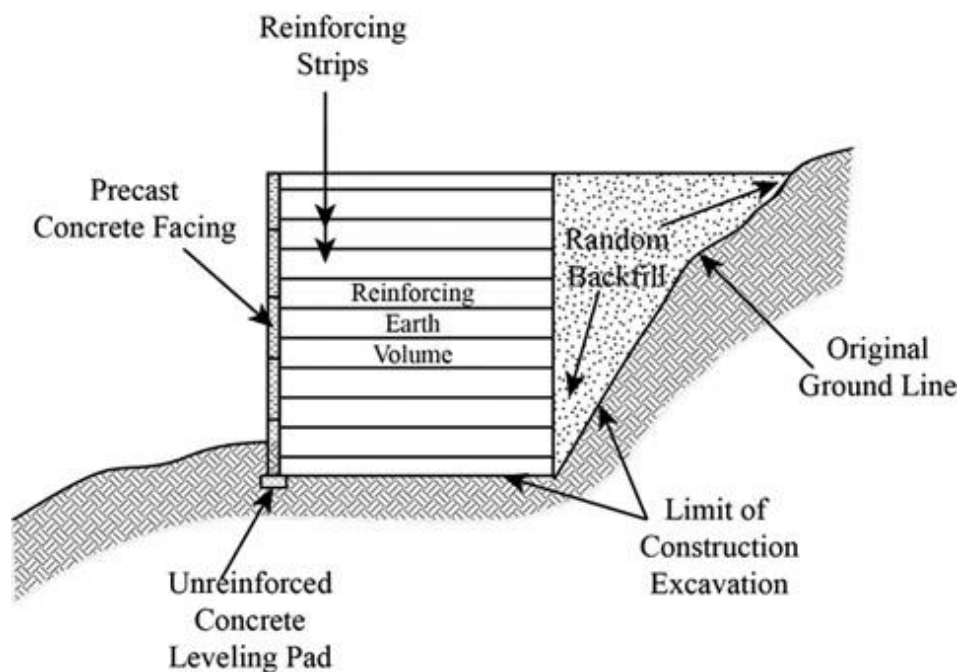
Reinforced earth retaining wall (www.constrofacilitator.com)
